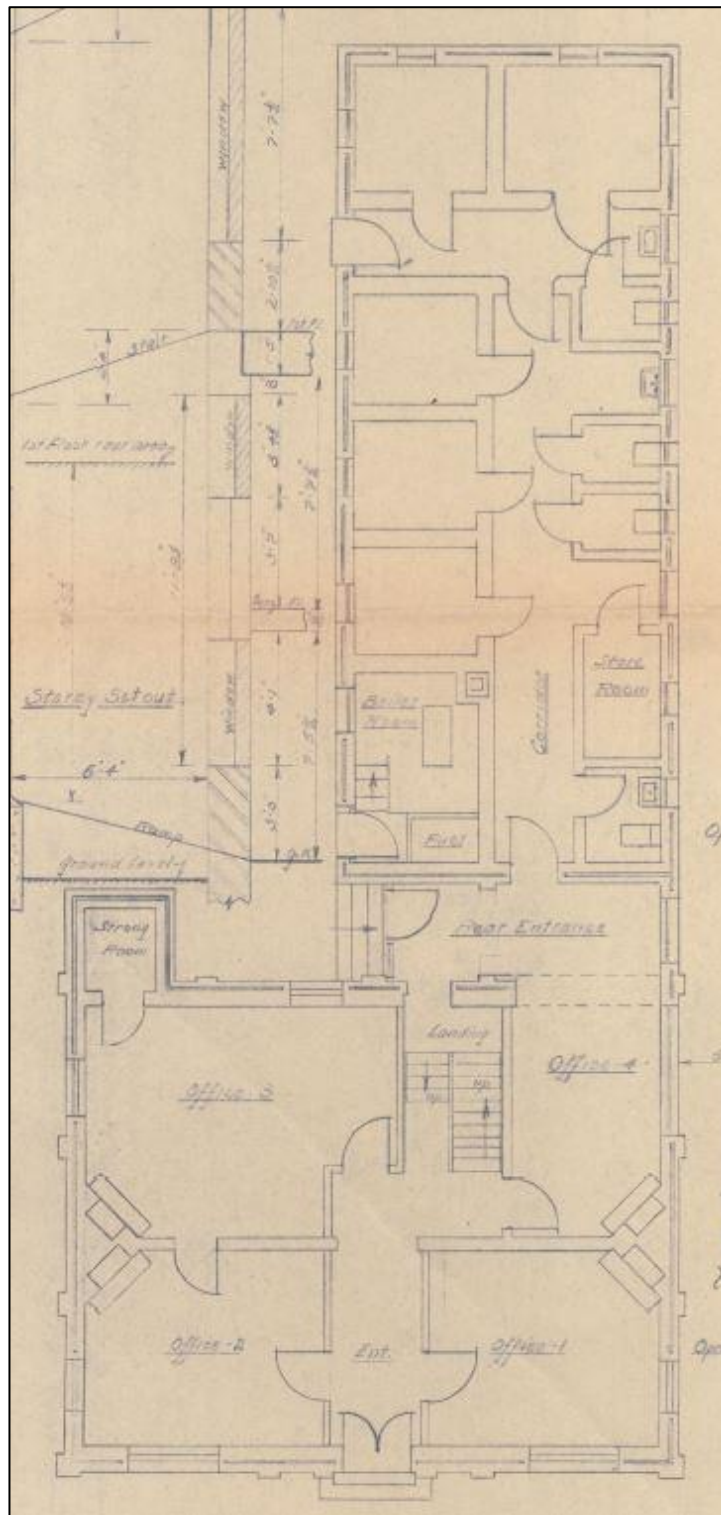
Detail from 1970 alteration plans showing ground floor layout of second police station (McLellans Invercargill Ltd, 1970).
